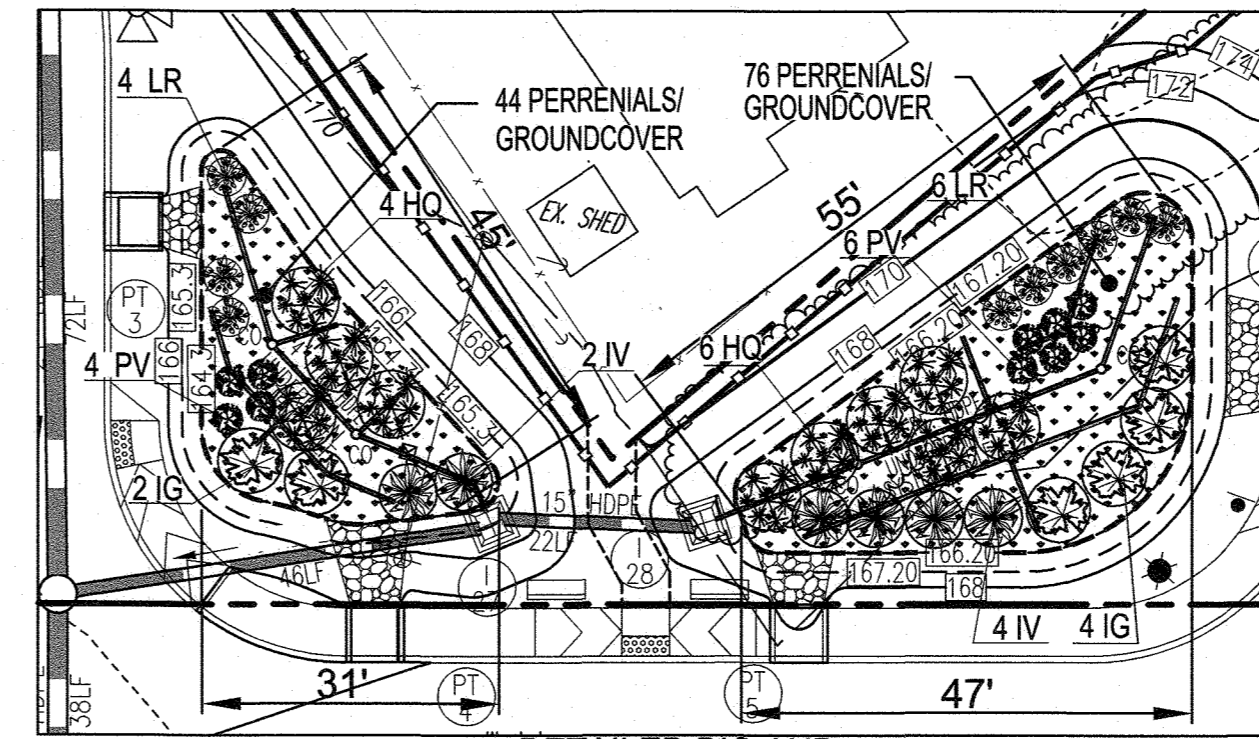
DETAILED BIO AND PLANTING PLAN (SWM #15)
